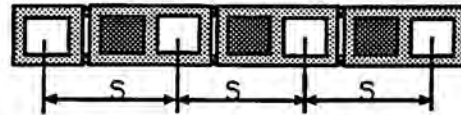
b Spacing of Grouted Cells for Flexural Walls
